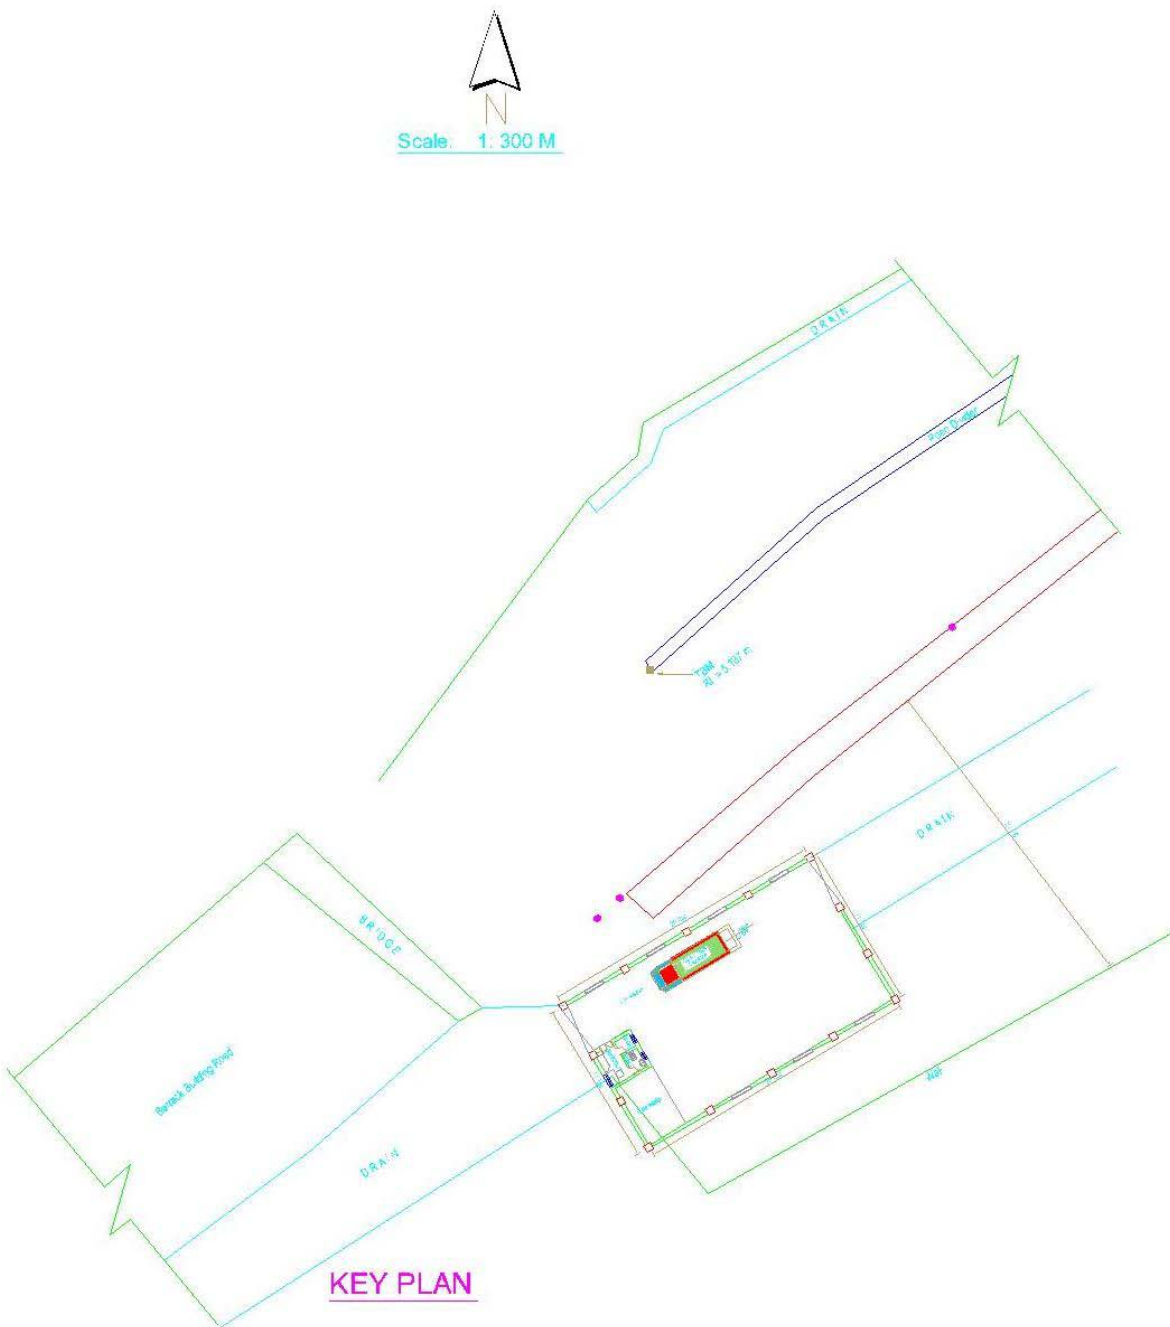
STS – 11 DT Road Nishkriti Layout Plan (22°16'24"N, 91°47'13"E)
